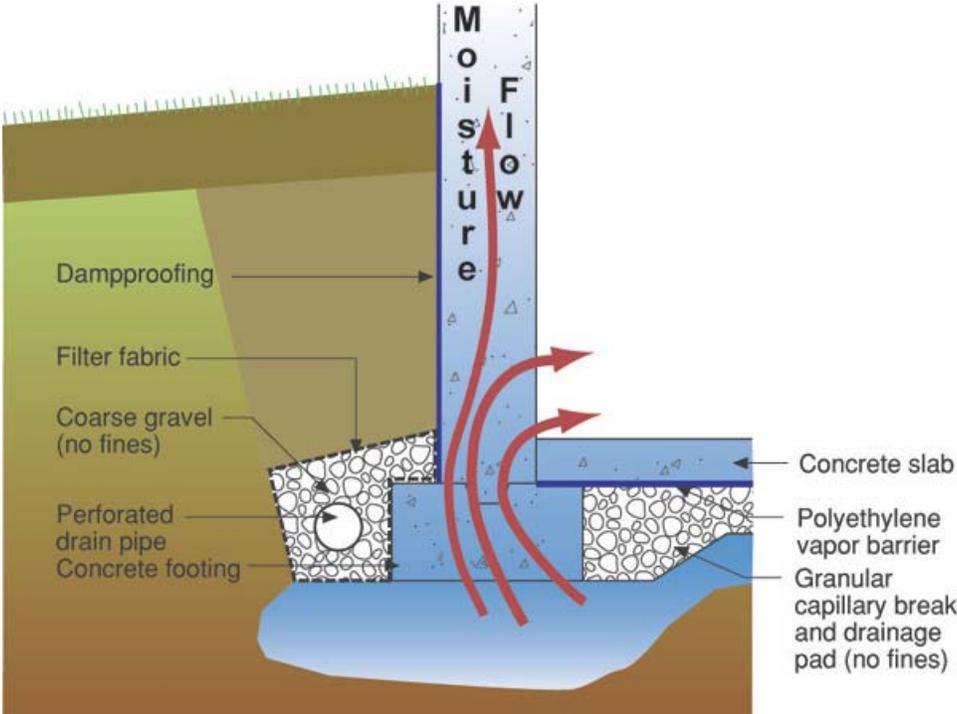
Capillary uptake of water through footing-to-foundation-wall connection
